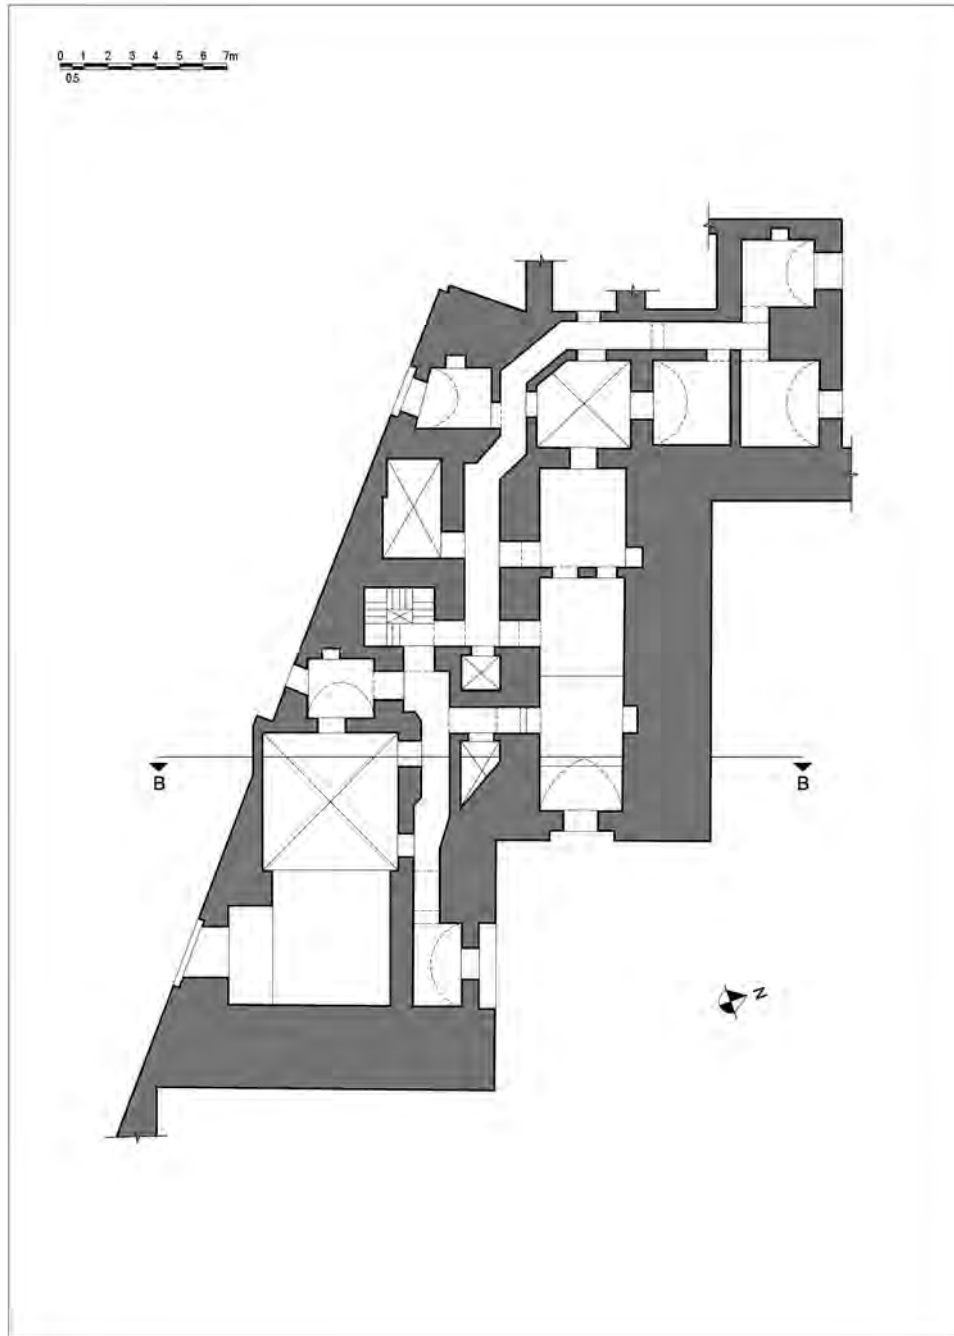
Ḥanbaliyah Madrasah, Complex of Sultan Ḥasan, second floor plan (H. Al-Harithy)
